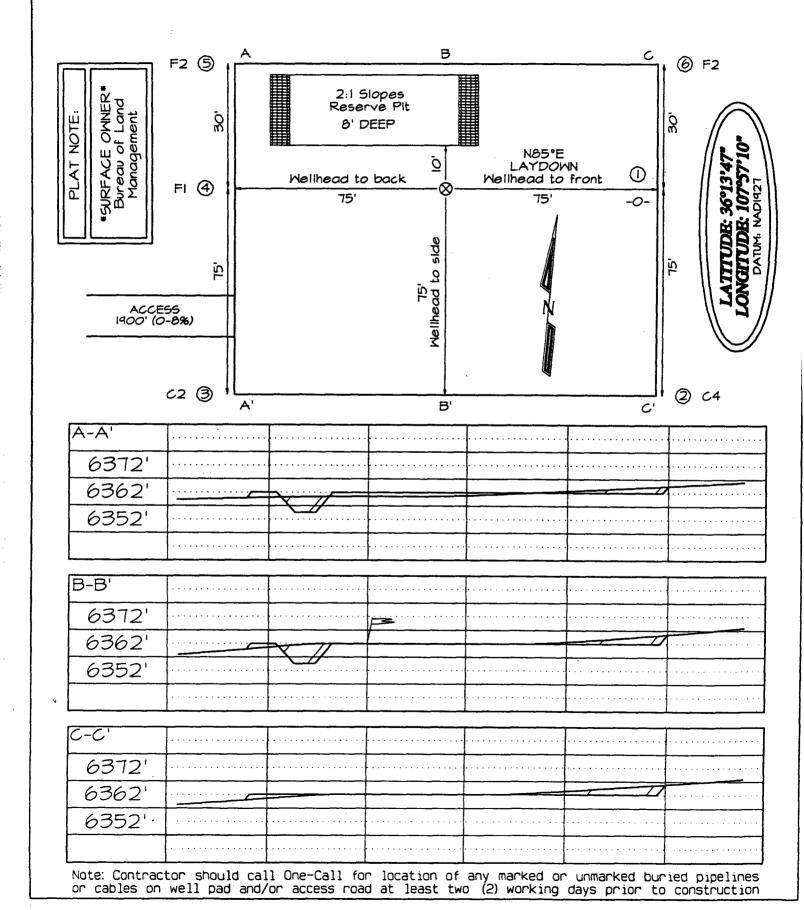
EXHIBIT B OPERATIONS PLAN Flo Jo #90
